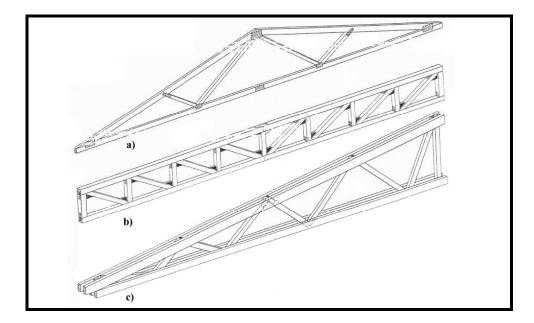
Triangular struts are glued by finger joints, in trigonit girder truss diagonals are joined by finger joints, double or triple flanges are nailed together with each nail loaded in double shear (Götz *et al.*, 1989:55-56).
